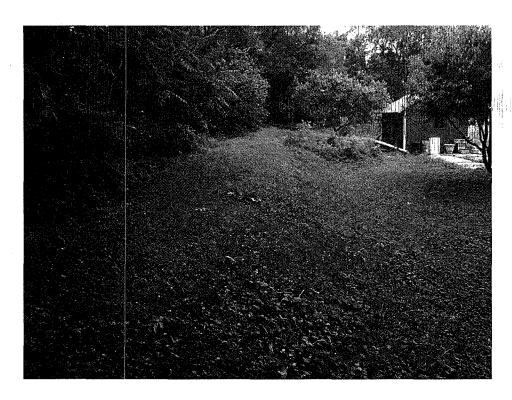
Levee embankment (looking east near Station 72+50) Note the dense vegetative growth on the riverward slope.
